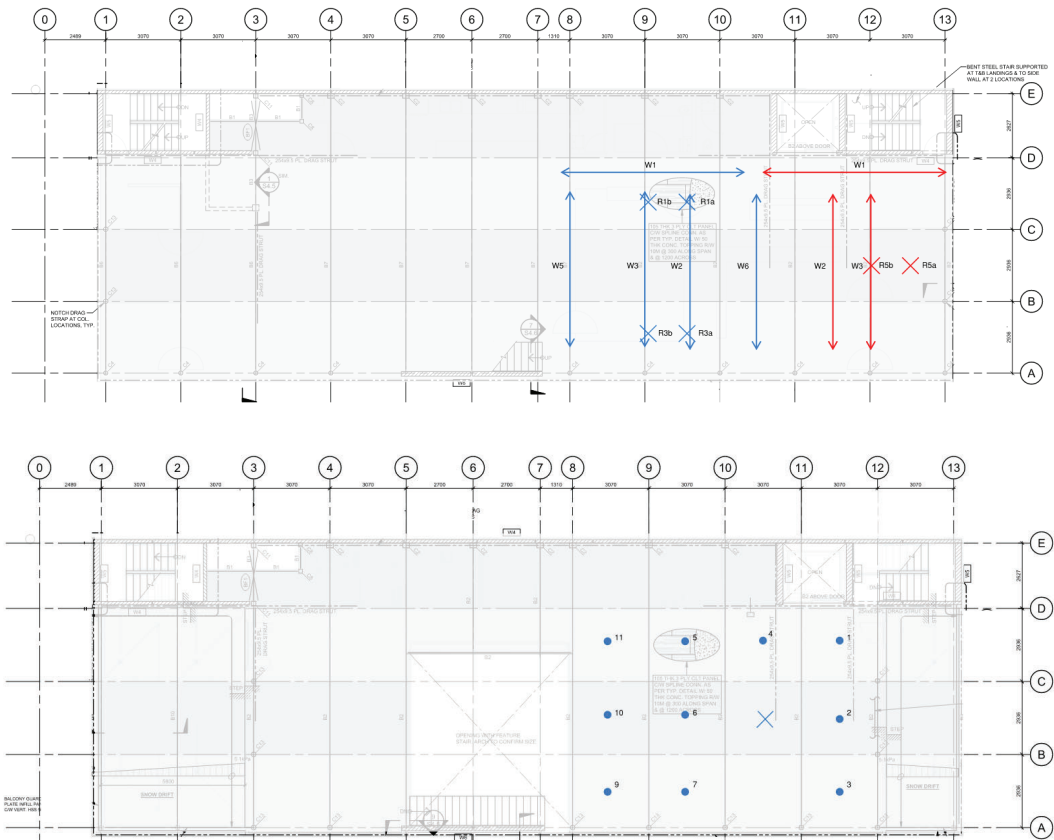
Summary of walking paths (W_i) and receiving locations (R_j) for testing on 3rd floor, and the heel drop locations on the fourth floor.
